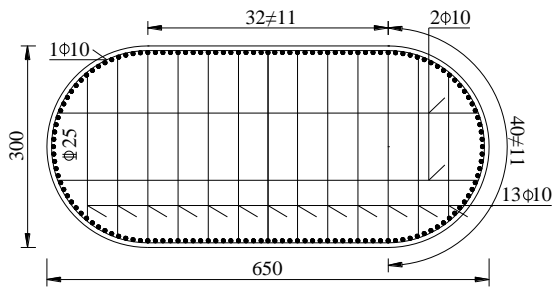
Cross section and reinforcement of the high-speed railway simple supported beam bridge pier (unit: cm)
